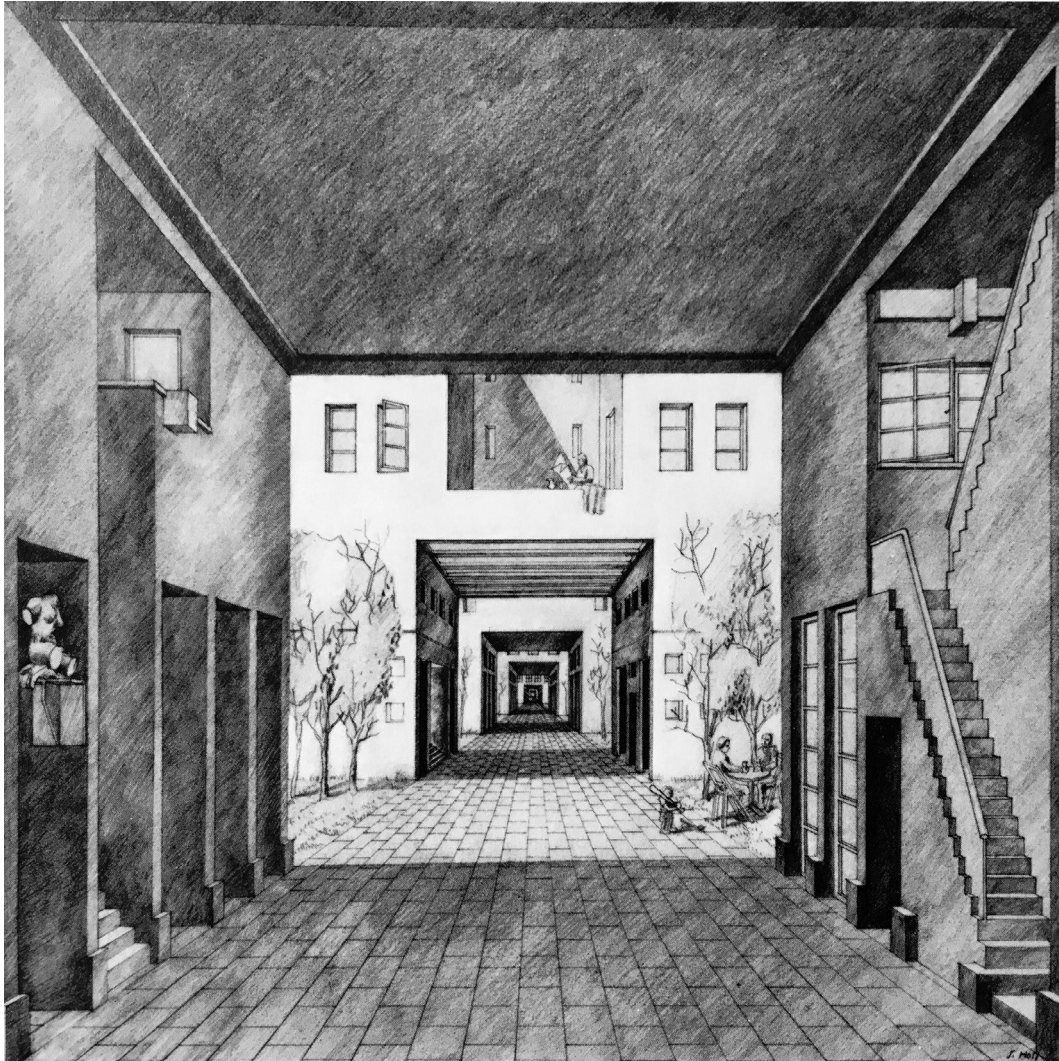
Steven Holl. Bridge of Houses. New York, sketch of the public promenade [1981]
